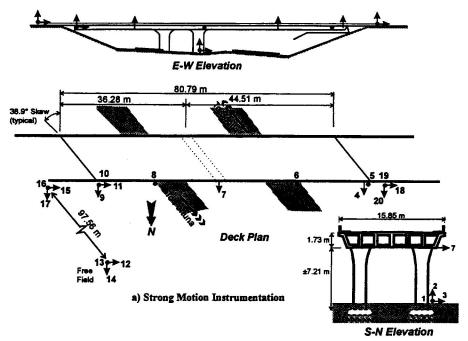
Dimensions and instrumentation of Painter Street Overpass.
